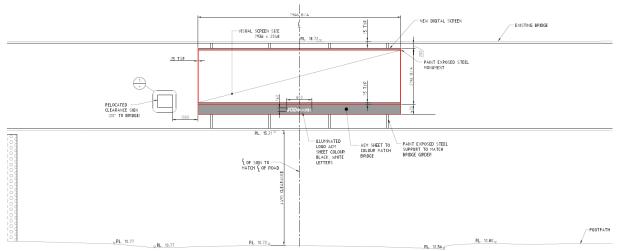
Proposed Digital Sign (Elevation Plan)
